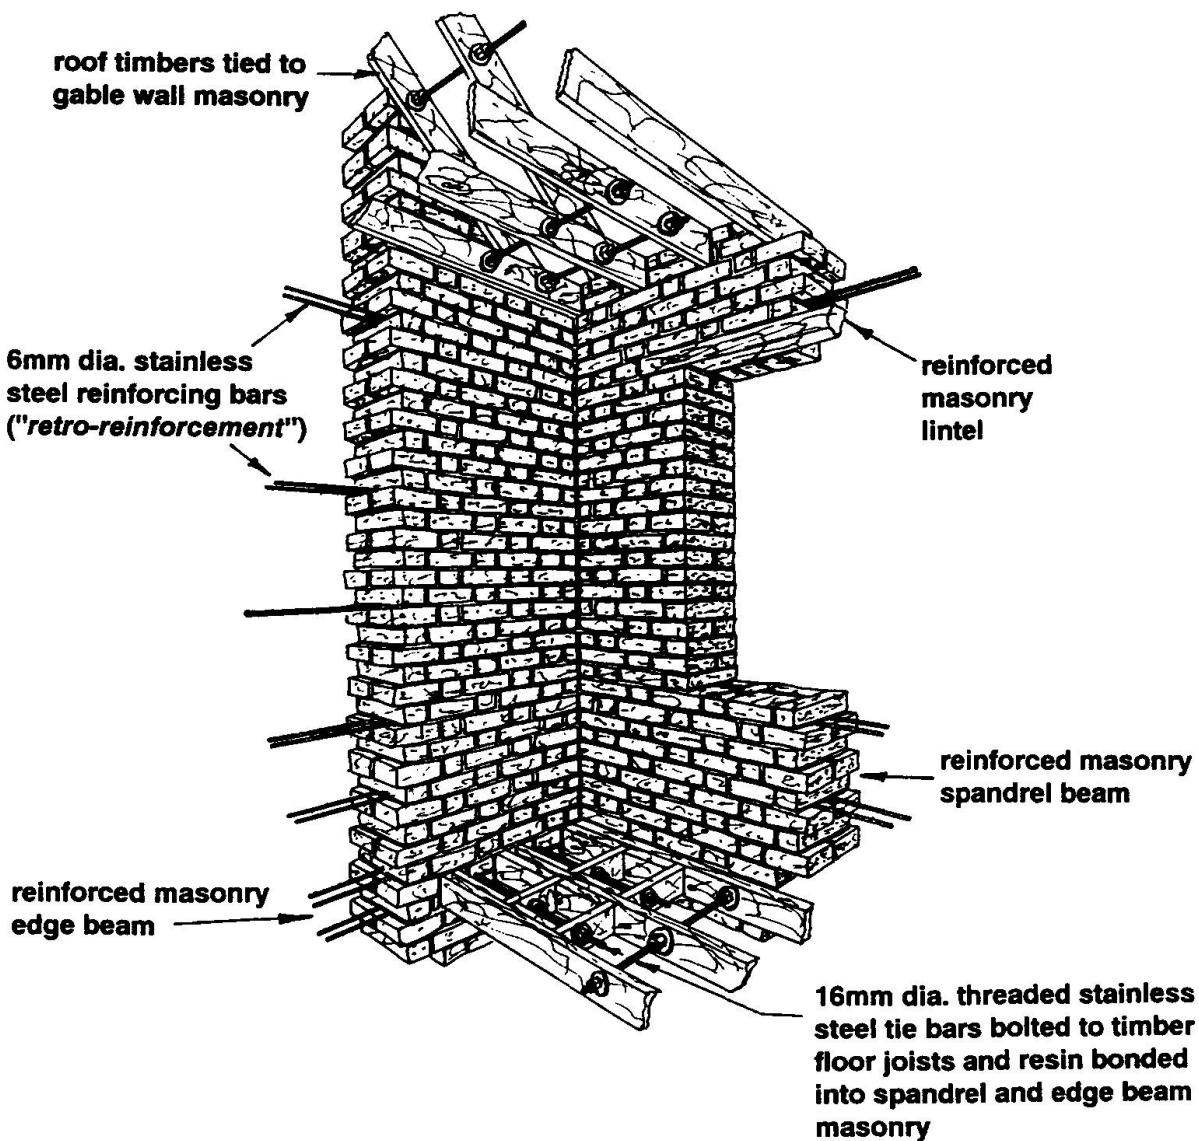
Typical retro-reinforcement repairs to low-rise masonry construction
